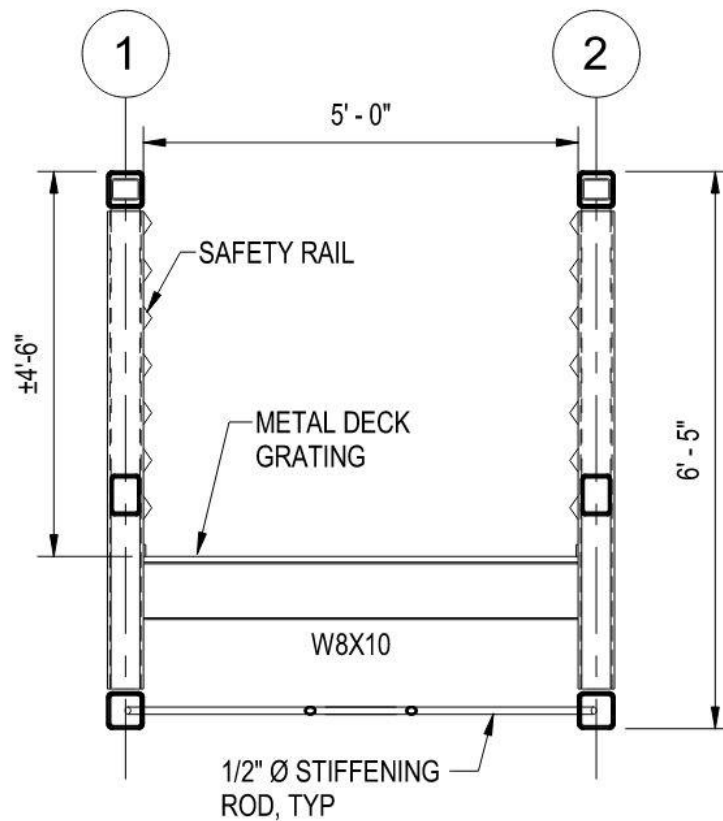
TRUSS BRIDGE SECTION, SPAN 84'
